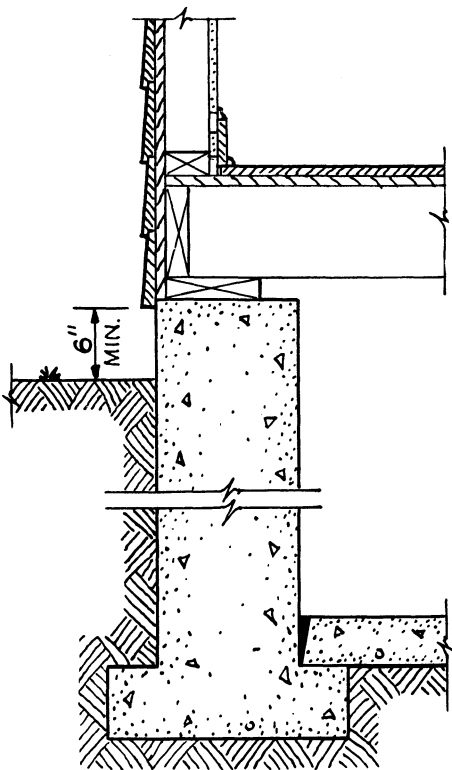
Poured-concrete foundation walls or piers that are easily inspected, offering complete protection against hidden termite infestation. All form boards and wood debris must be removed from the soil. Expansion joints should be filled with coal-tar pitch.
